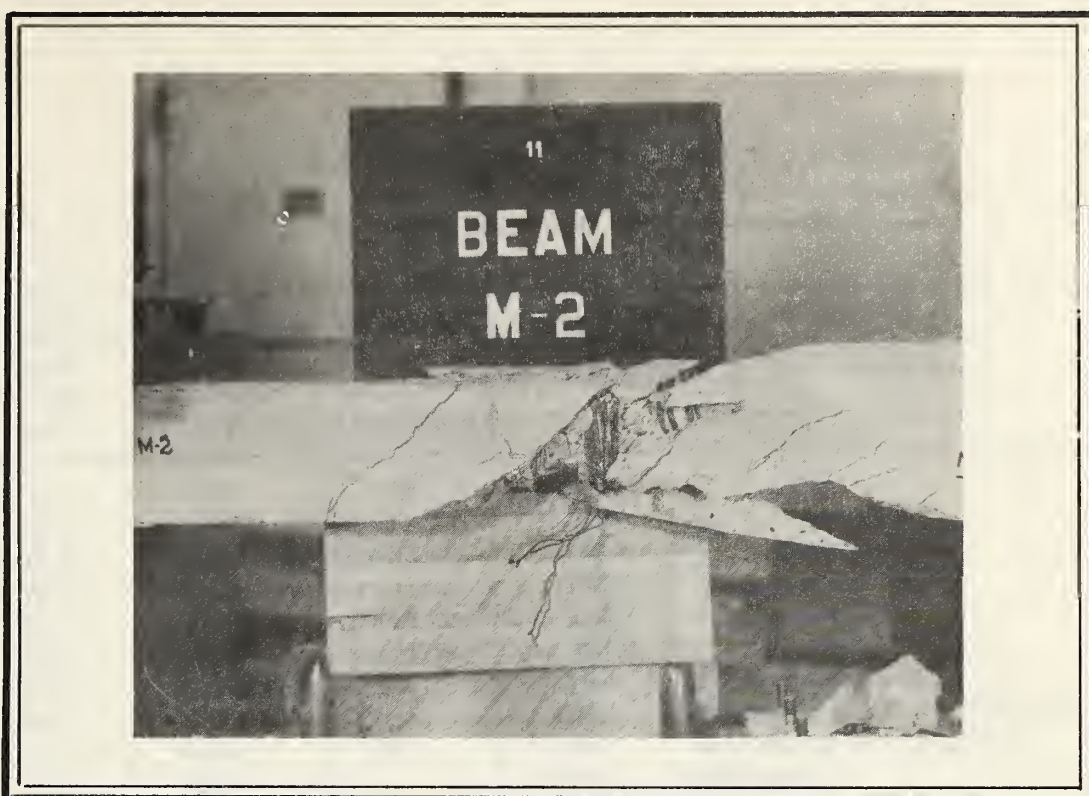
TEST SPECIMEN M.2 SEEN FROM WEST SIDE AFTER COLLAPSE
